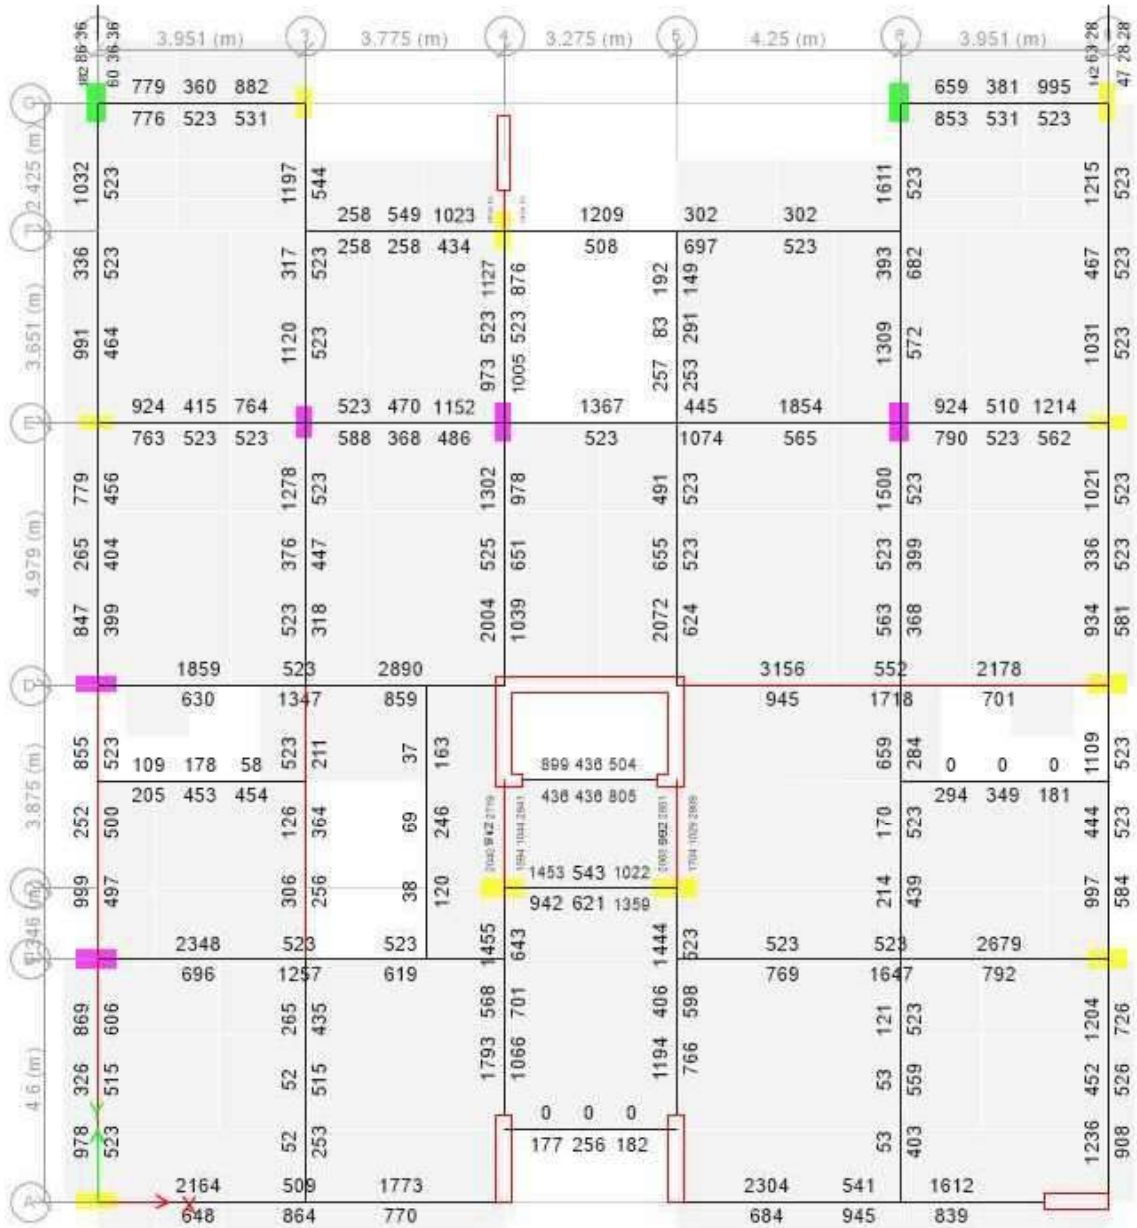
Reinforcement of 2nd Floor Beam (mm²)
